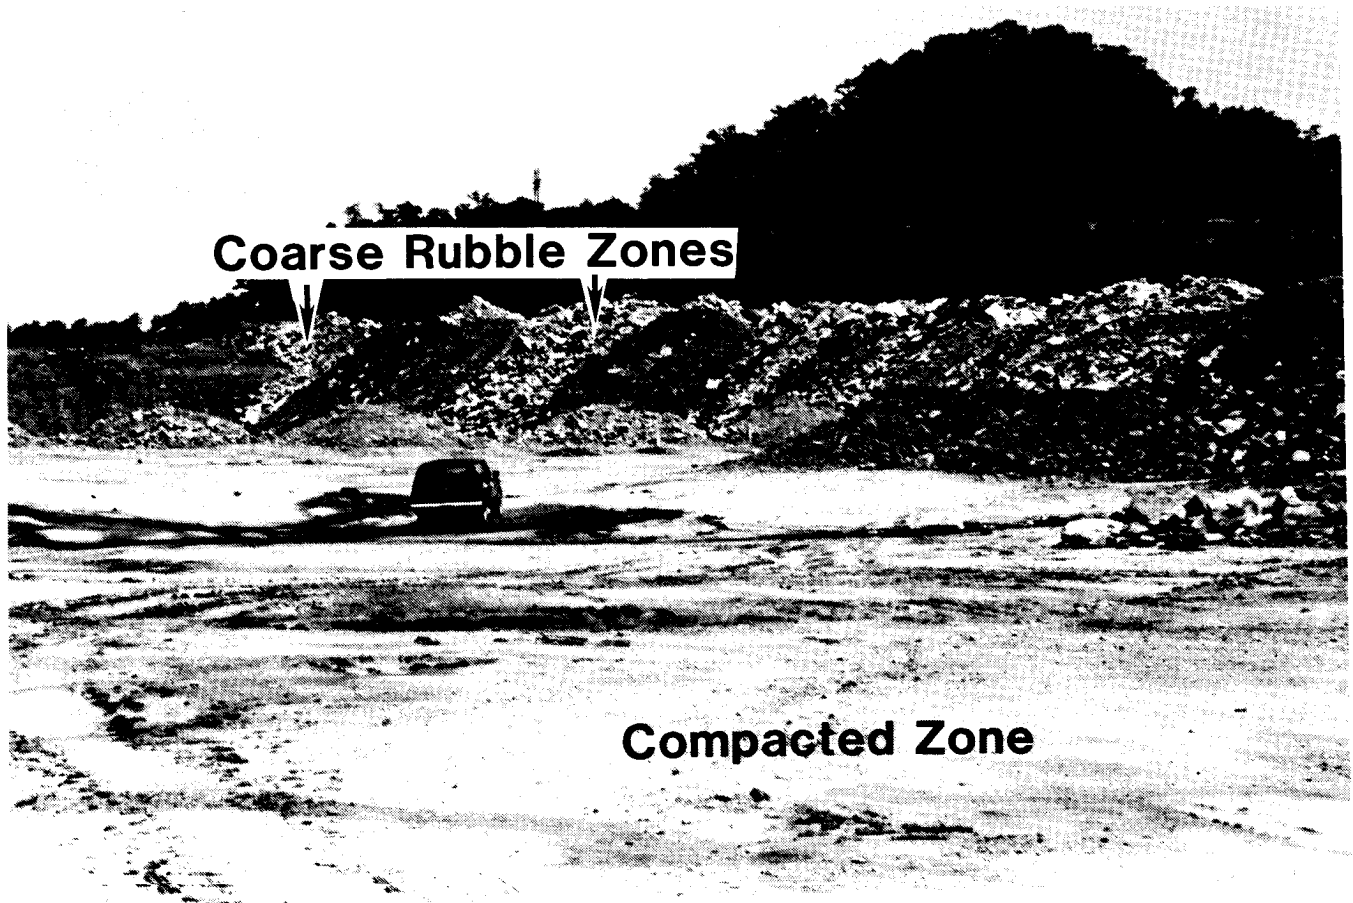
End-dumped spoil on top of temporary haul-road surface.
